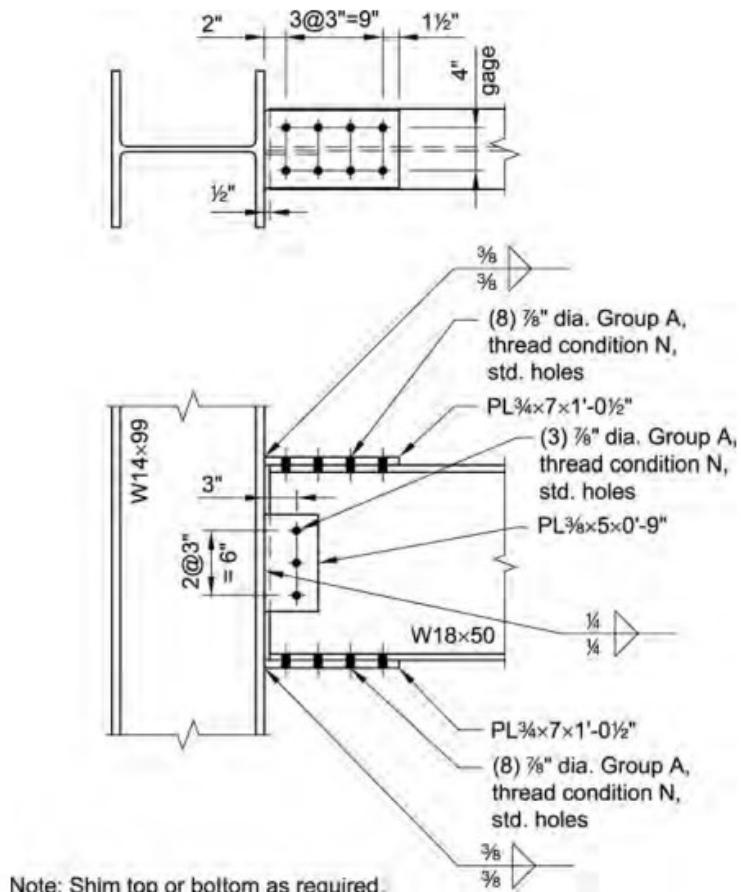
Bolted Flange-Plated FR Moment Connection (Beam-to-Column Flange) (Photo Credit: AISC)
